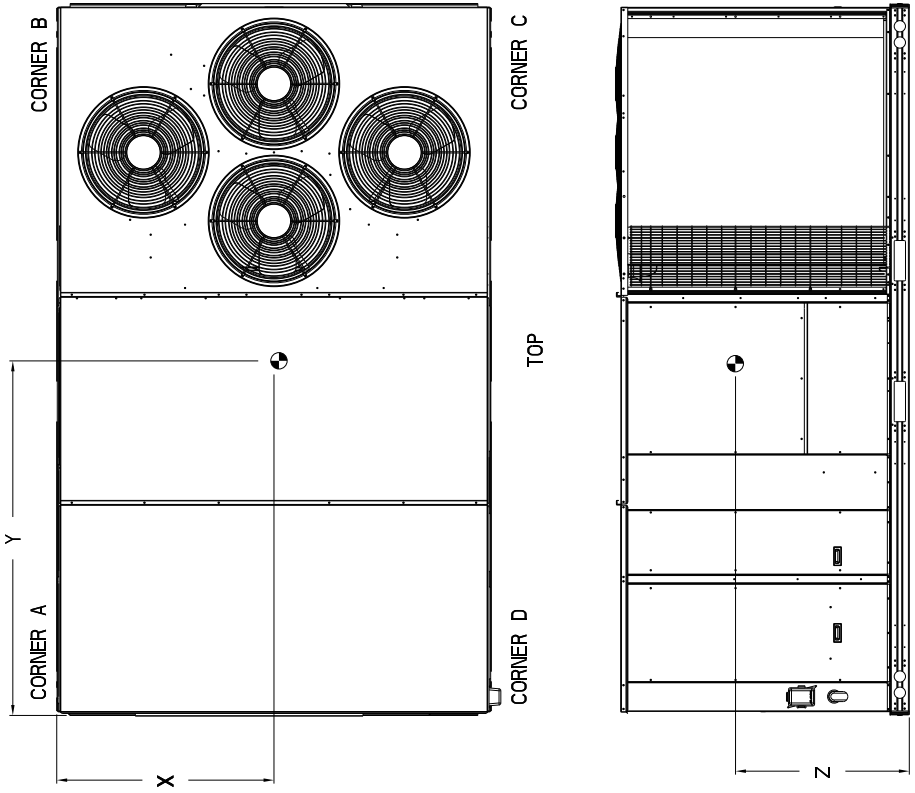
(cont.) - Unit Dimensional Drawing – 17 and 20 Size Units, Sheet 2 of 3
